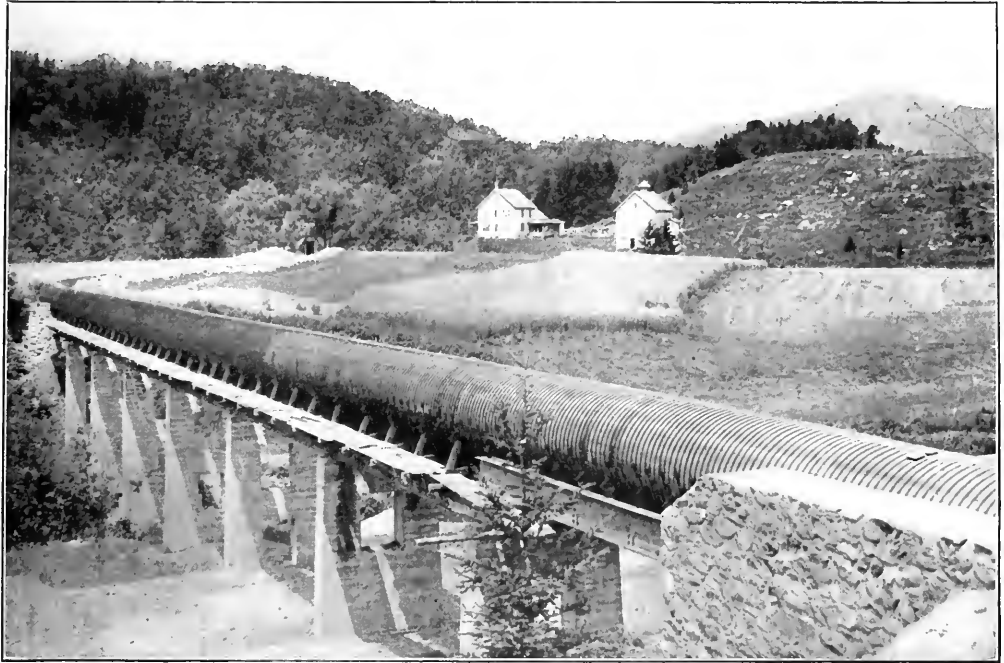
CONCRETE TRESTLE SUPPORTING THE PENSTOCK
